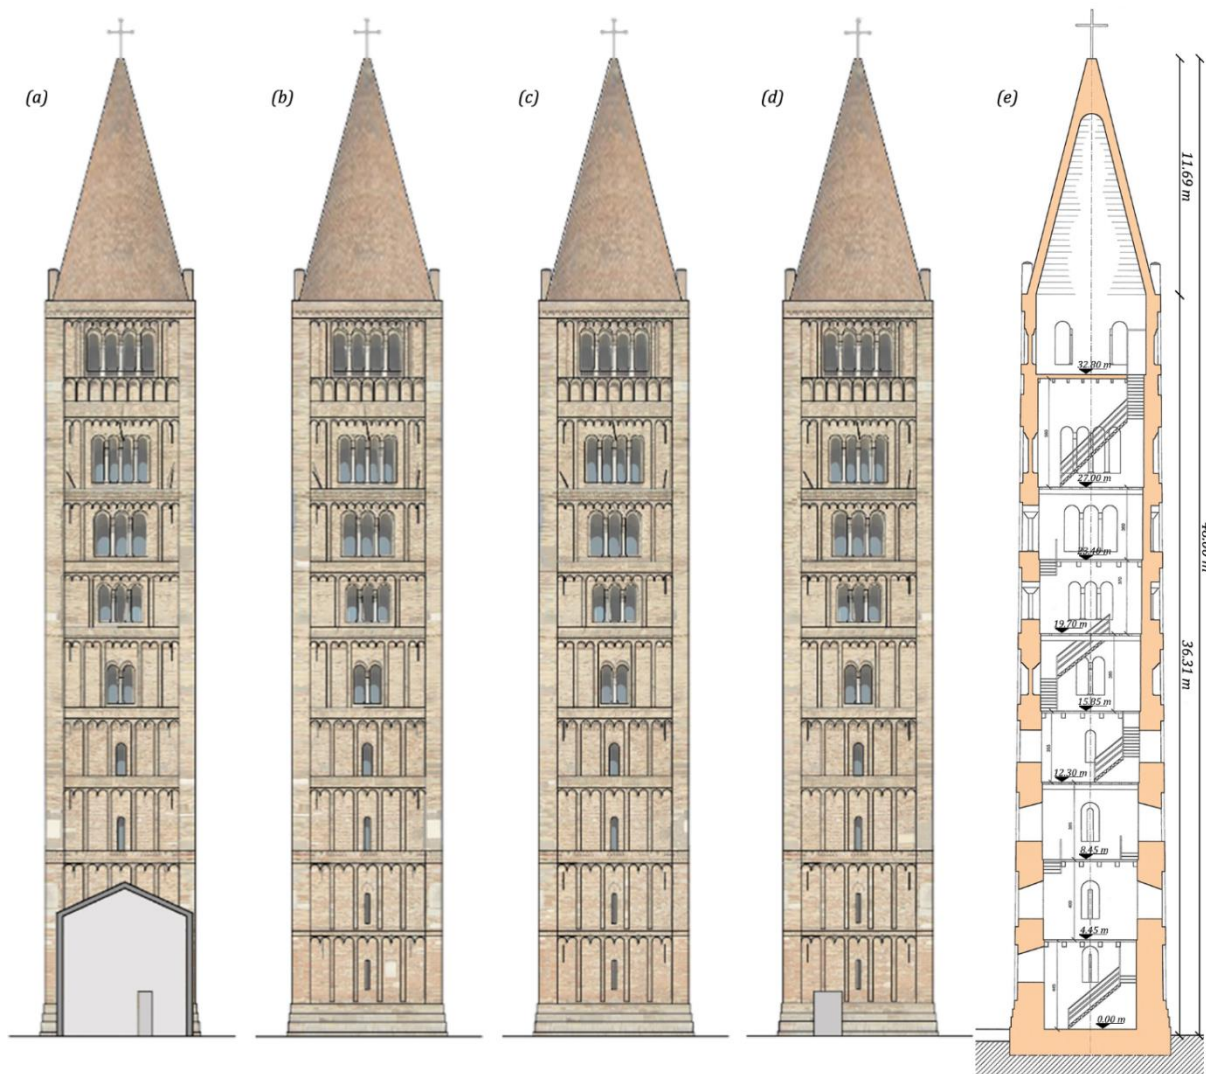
\_ Drawings of the bell tower of Pomposa Abbey in Codigoro (Italy): South-West façade (a), North-West façade (b), North-East façade (c), South-East façade (d) and vertical cross section (e)
